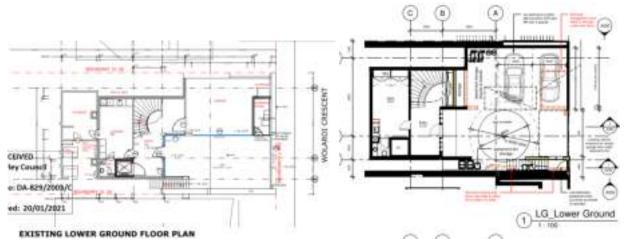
Plans showing the existing Lower Ground Floor Plan as submitted under DA-829/2003/C (left) in comparison to the existing Lower Ground Floor Plan submitted under this current DA (right).
